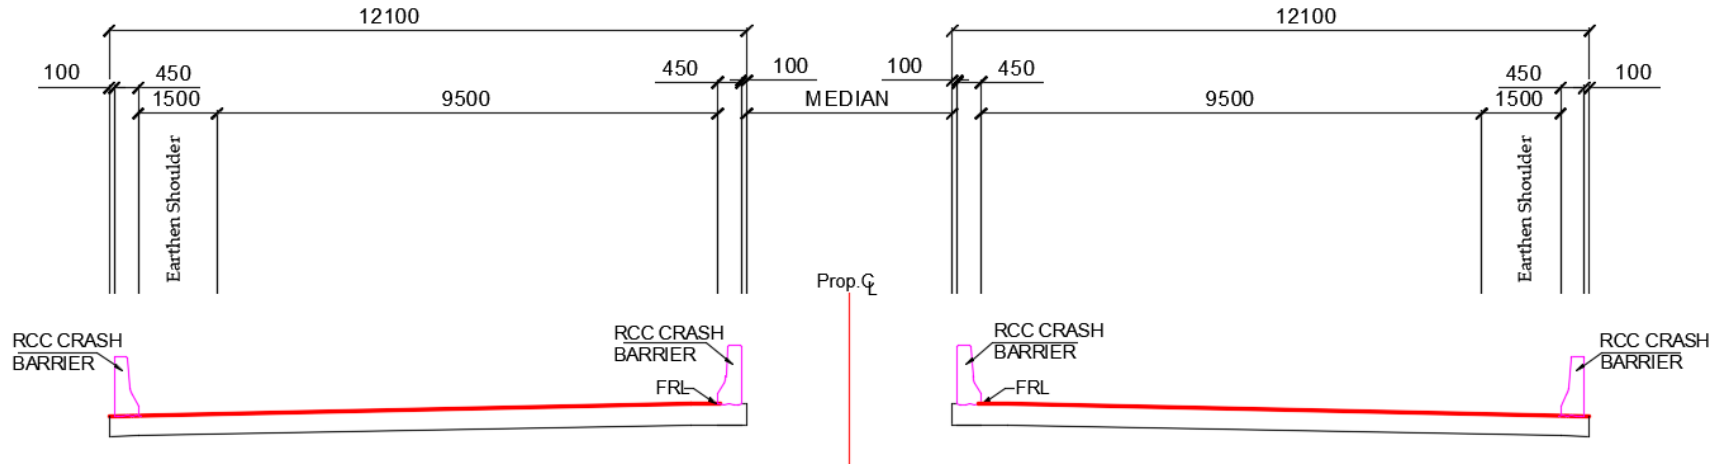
4-Lane Grade Separated Structure & Bridge at Deck Level without Footpath (TCS-11)
